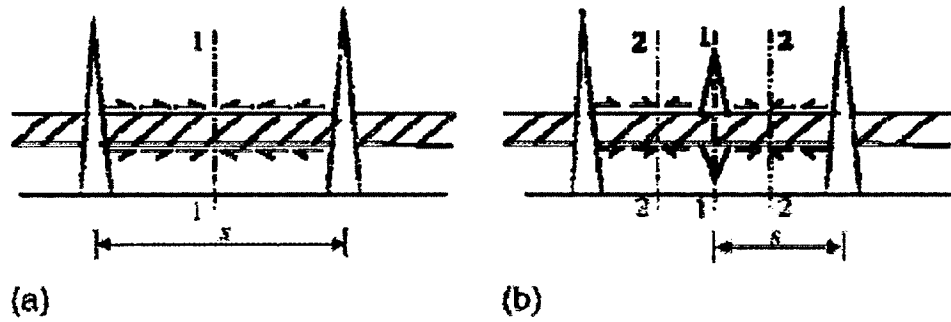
Primary and secondary cracking in concrete: (a) section of highest concrete tension; (b) next section of highest concrete tension
